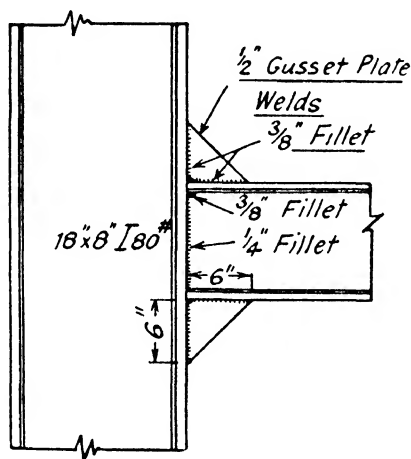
ALTERNATIVE RIGID BEAM-TO-COLUMN CONNECTION FOR SMALL BEAM
